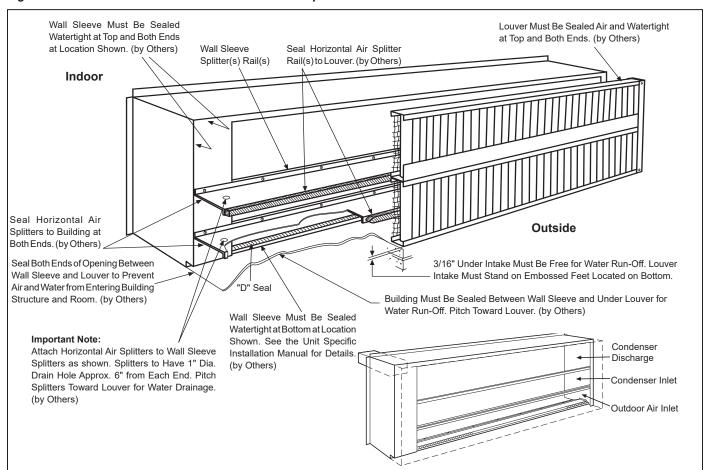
Sealing Full Projection Wall Sleeve and Horizontal Air Splitters
